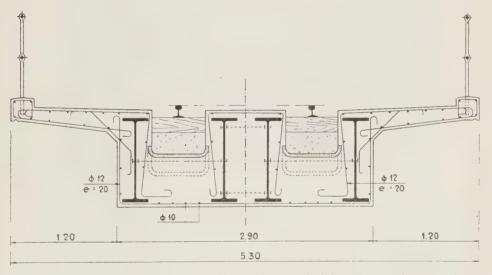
Danish State Railways. - Bridges with encased girders. Segmental construction.
